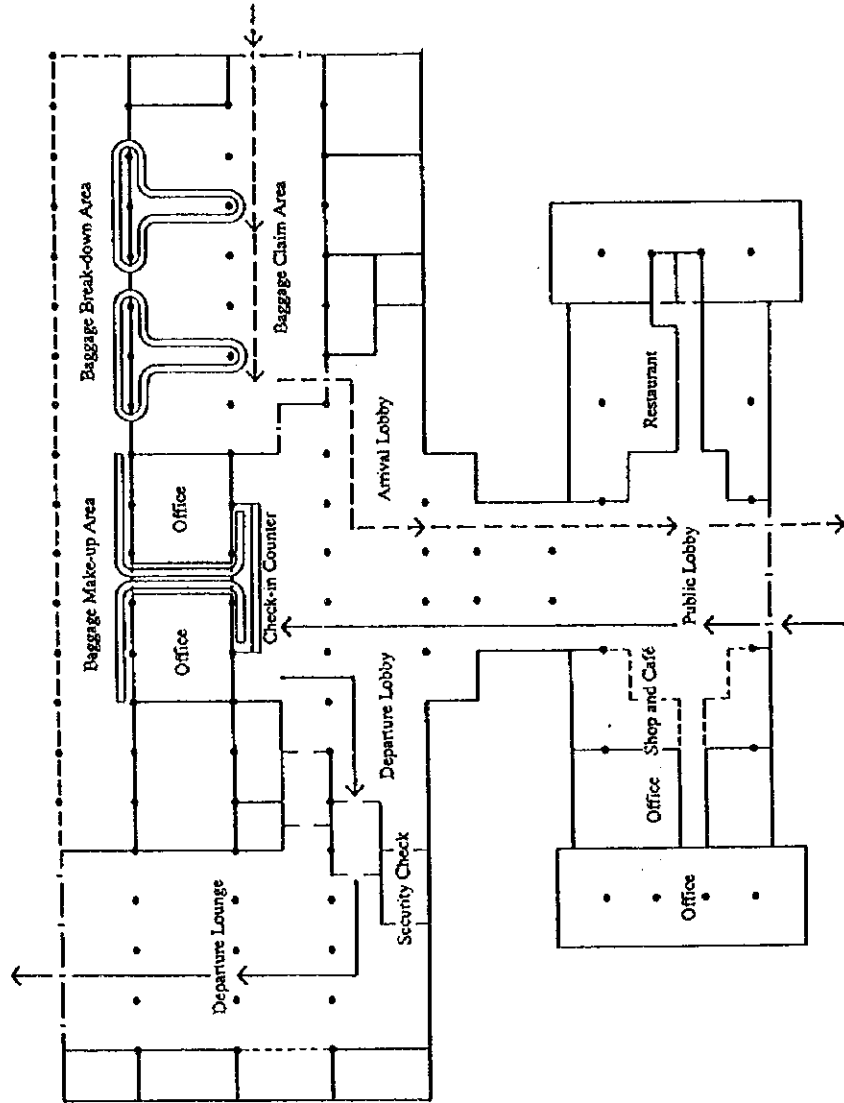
Development Plan of Domestic Passenger Terminal Building (1st Floor)
